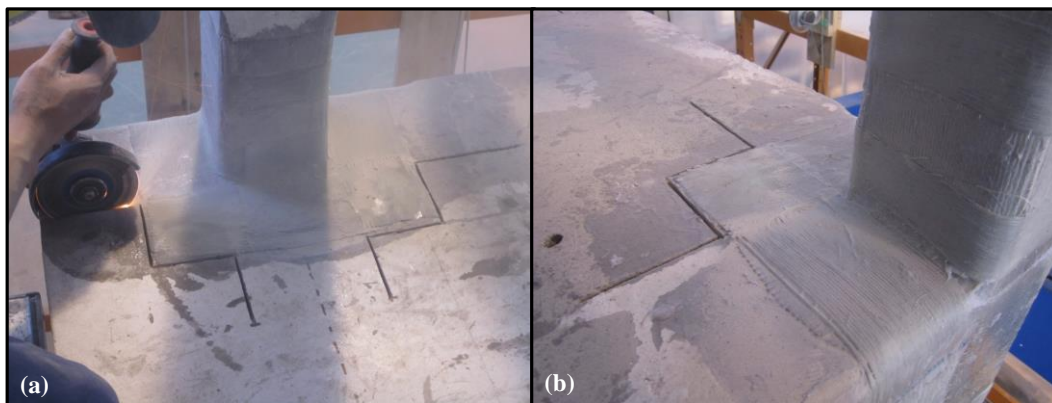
Slab weakening in beam column joints (a) cruciform, and (b) corner.
